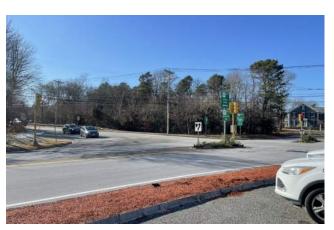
View from Silver Beach Pizza & Seafood to Route 151 / North Falmouth Highway intersection with poor layout
